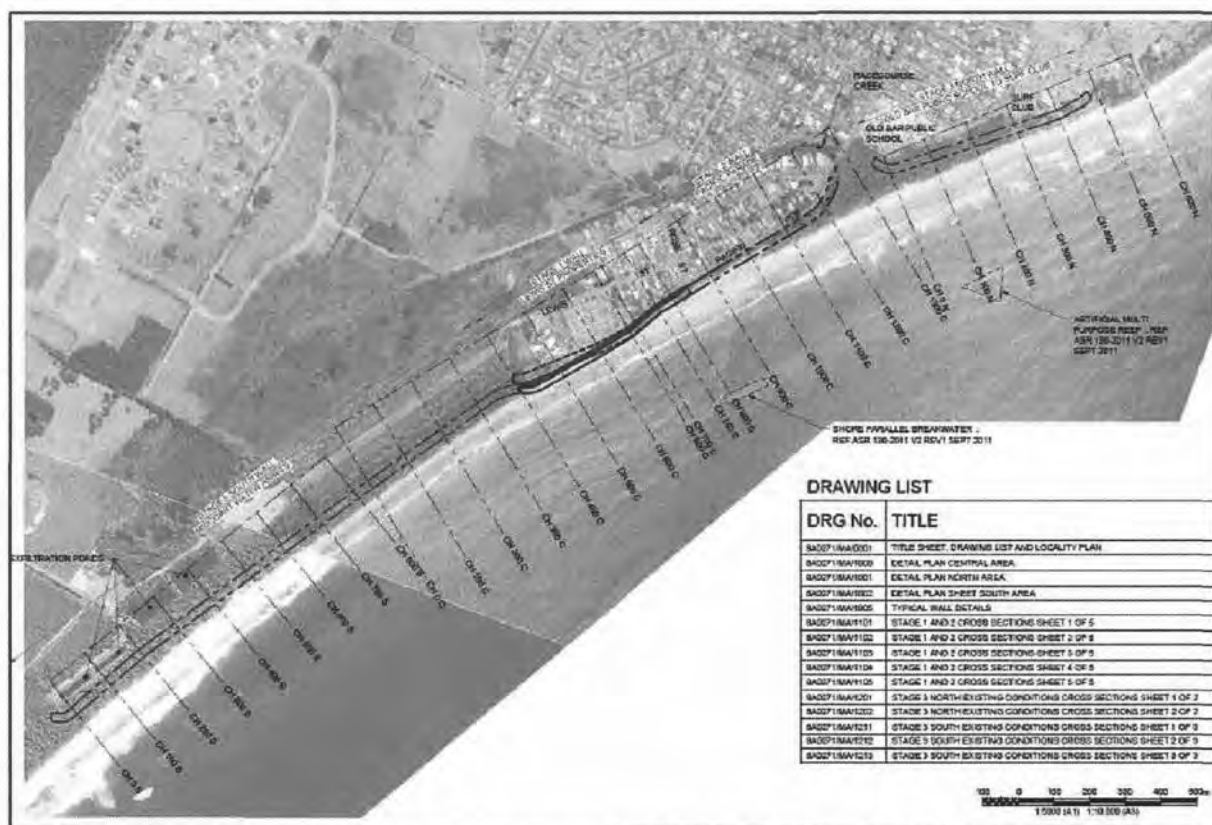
Preliminary design layout for rock revetment constructed in three stages (Extract Dwg 8A0271-MA-0001 C, Appendix D; RHDHV, 2013)
